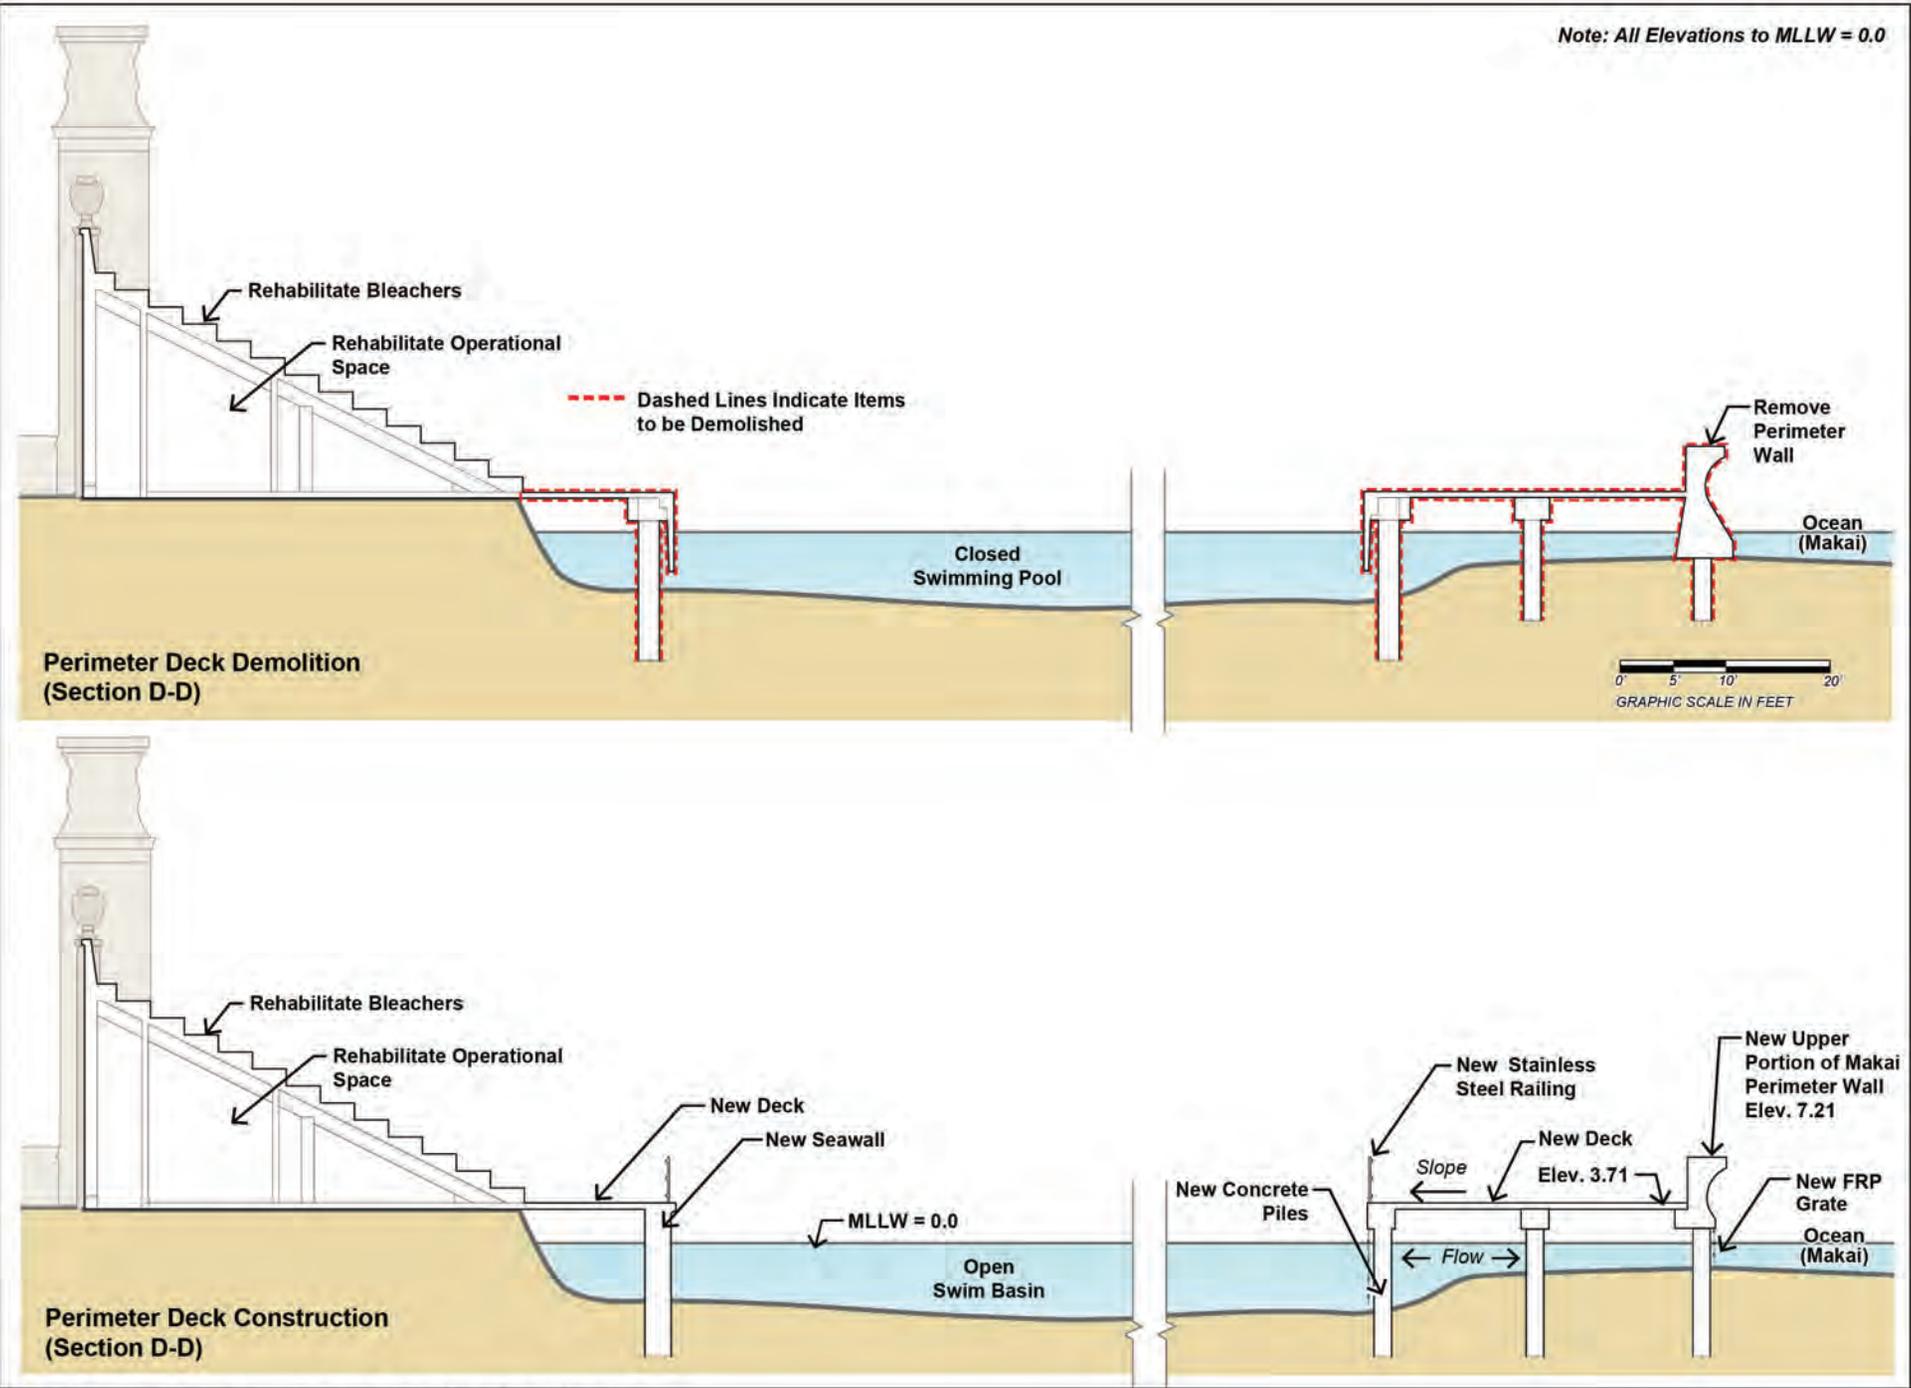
PERIMETER DECK SECTION D-D
